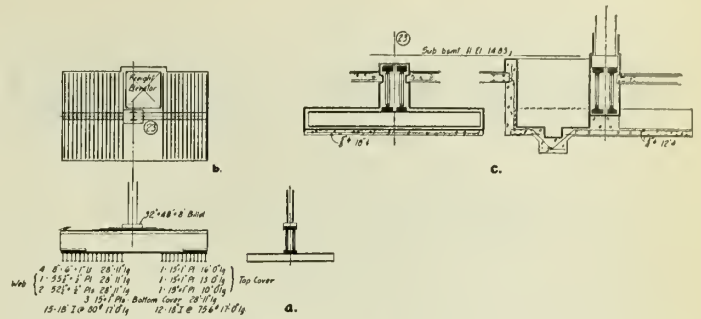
and 9b.—Concrete Slab and Billet Foundation at Elevator Pit.
